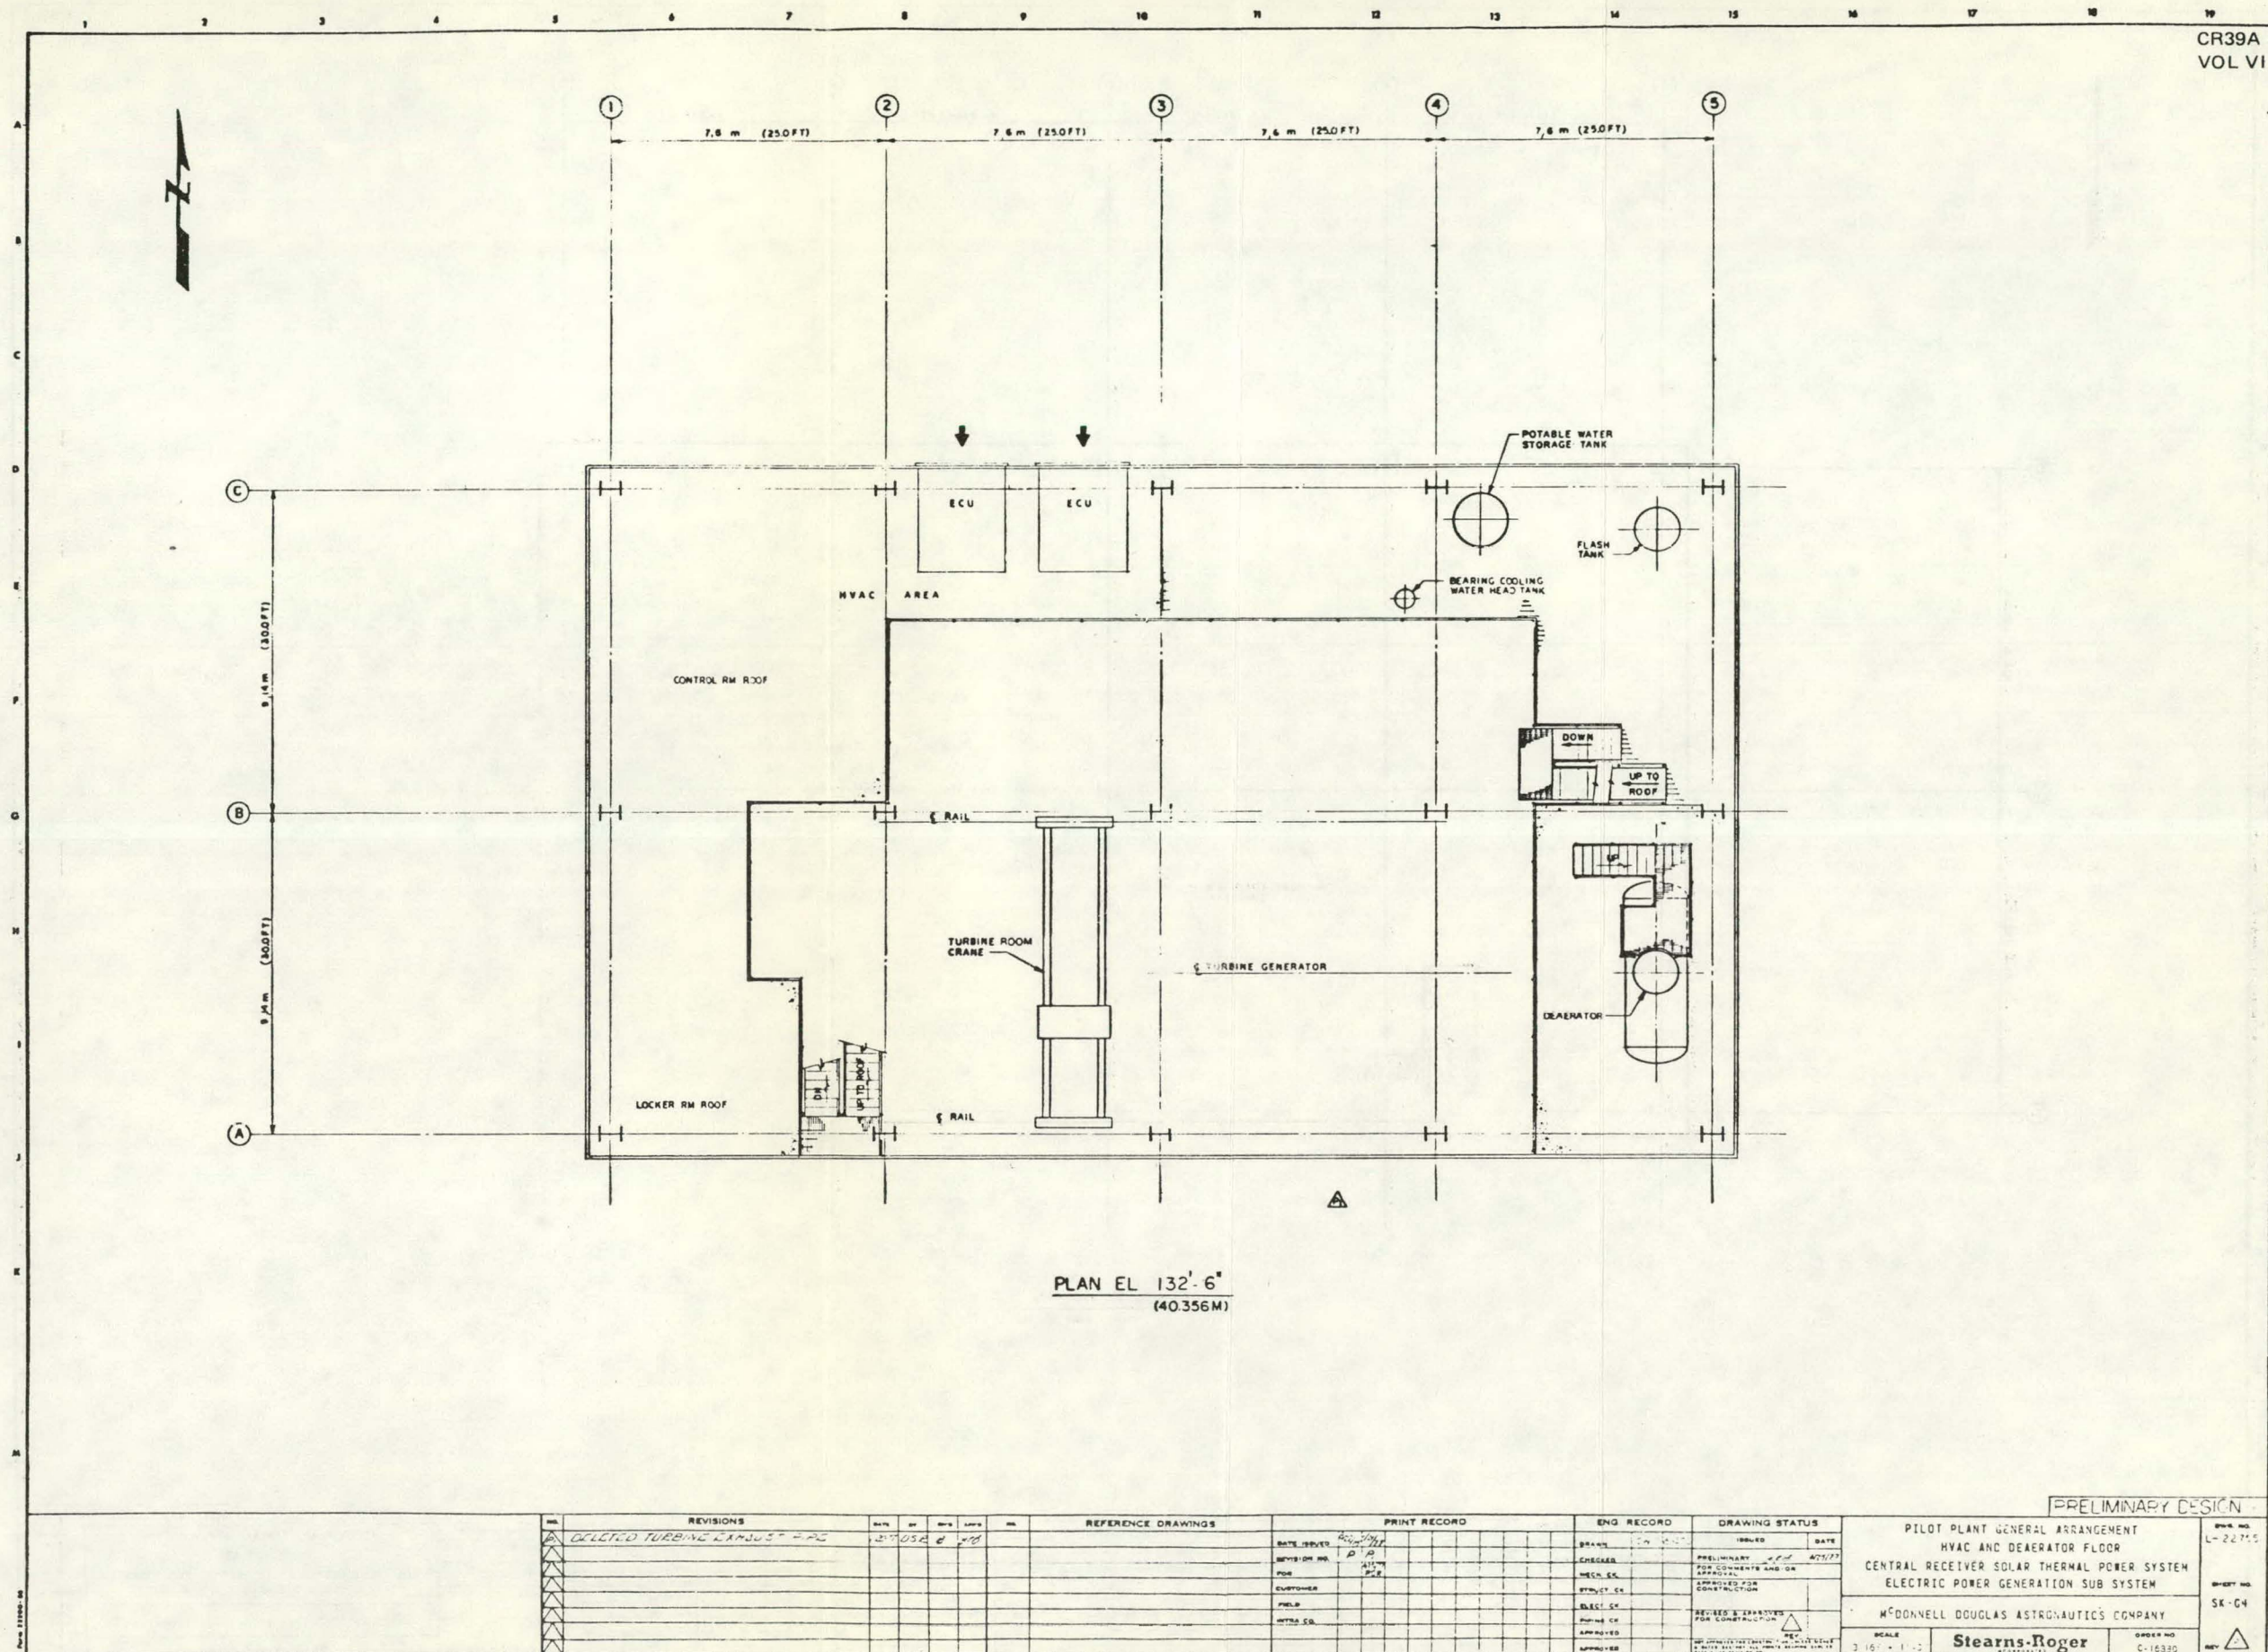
Pilot Plant General Arrangement -- HVAC and Deaerator Floor, EPGS
